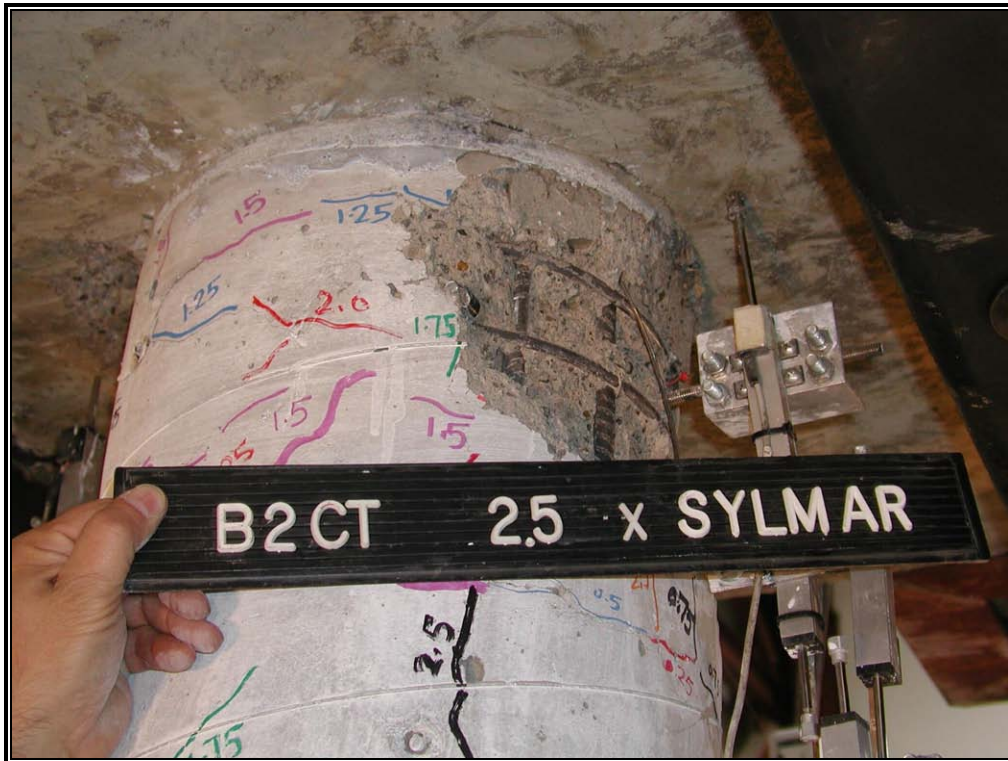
Concrete Spalling on East Side of West Column
